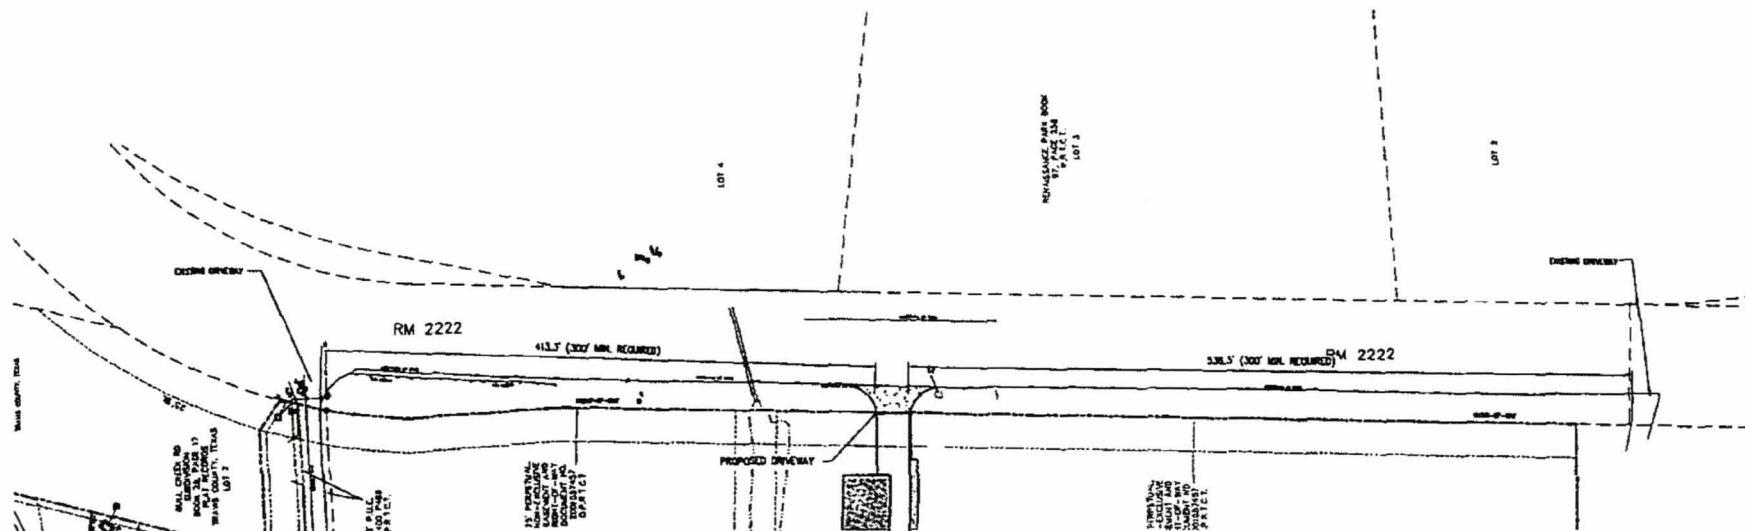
EXHIBIT M - DRIVEWAY DETAILS - (3 of 5)
